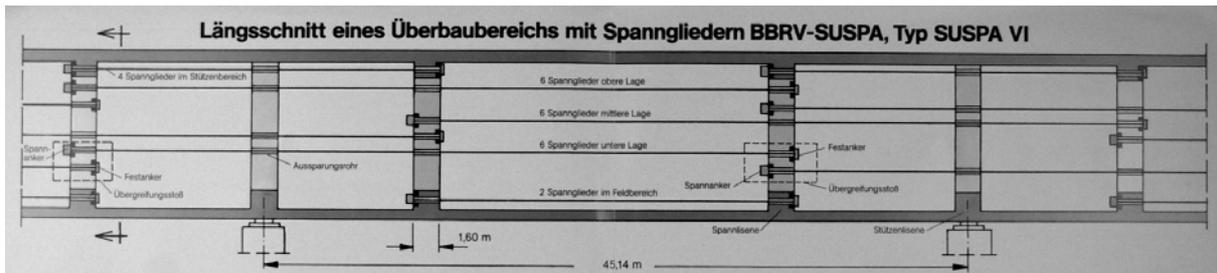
(a): Berbke Bridge, first modern externally prestressed bridge built in Germany, longitudinal section showing arrangement of straight cables. (SUSPA)
